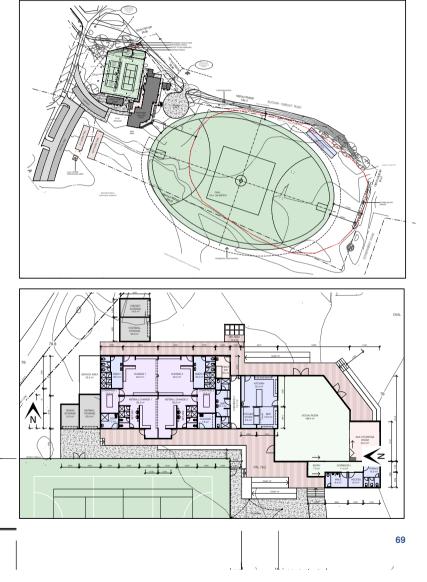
Buchan Recreation Reserve MP and Pavilion Plan
